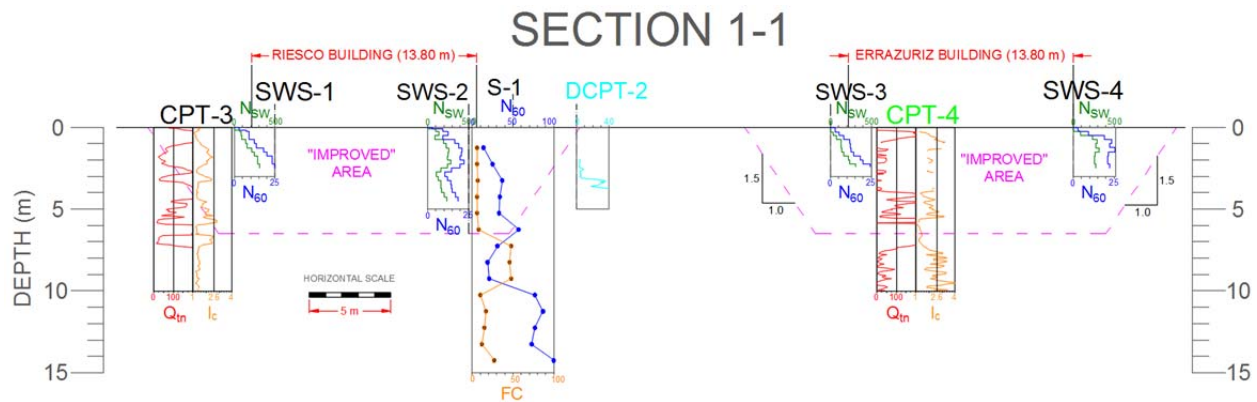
Section 1-1 through the south side of Buildings Riesco and Errazuriz
